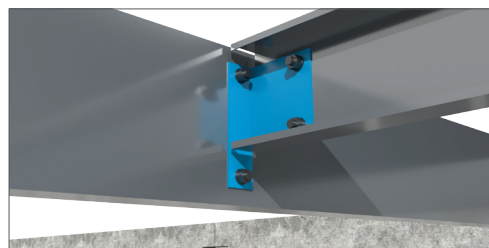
Detail of the connection of trimmer components. The joint is bolted through an atypical angle piece. The cross member is made of a lower section than the main trimmer beam. Holes in the trimmer main beam are punched along the standard reference axes, but an atypical connecting angle piece must be used. Should the cross member be connected through a standard TC angle piece, the holes in the trimmer main beam need to be made as non-standard.
